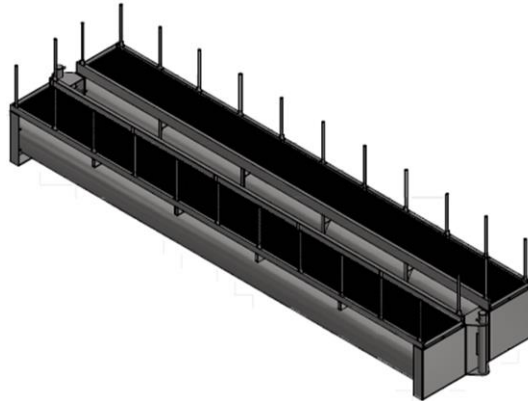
Design drawing of the Pontoon for retrieving the Direct Pipe® Machine
